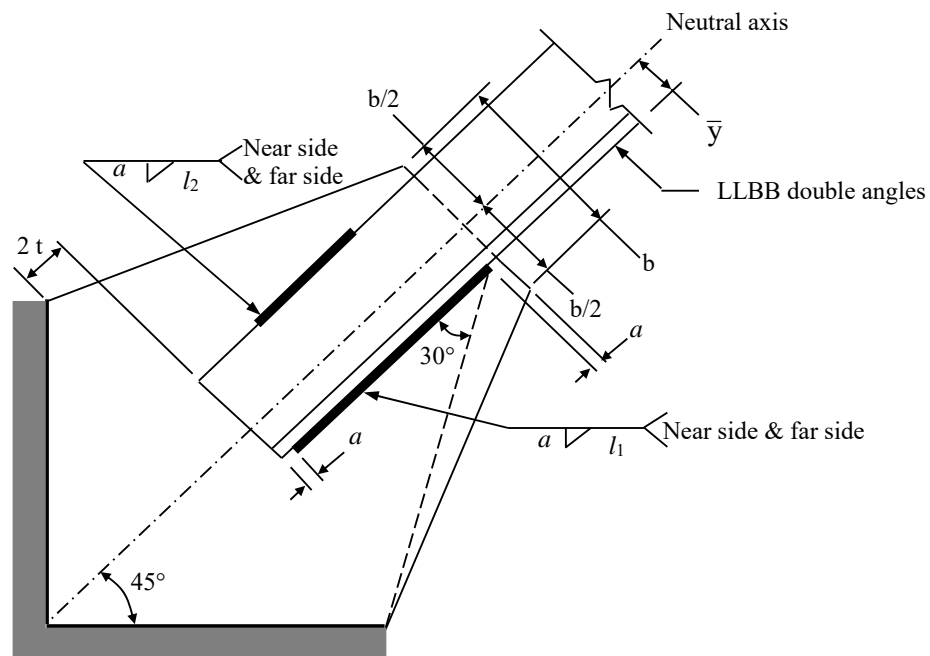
The Whitmore Section for Unequal-Length Welded Joints
